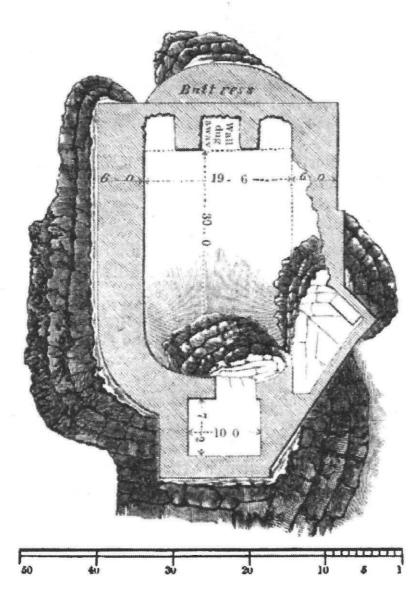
Plan of the ruins of the Tower, scale in feet (PLAS 1857, p103)
